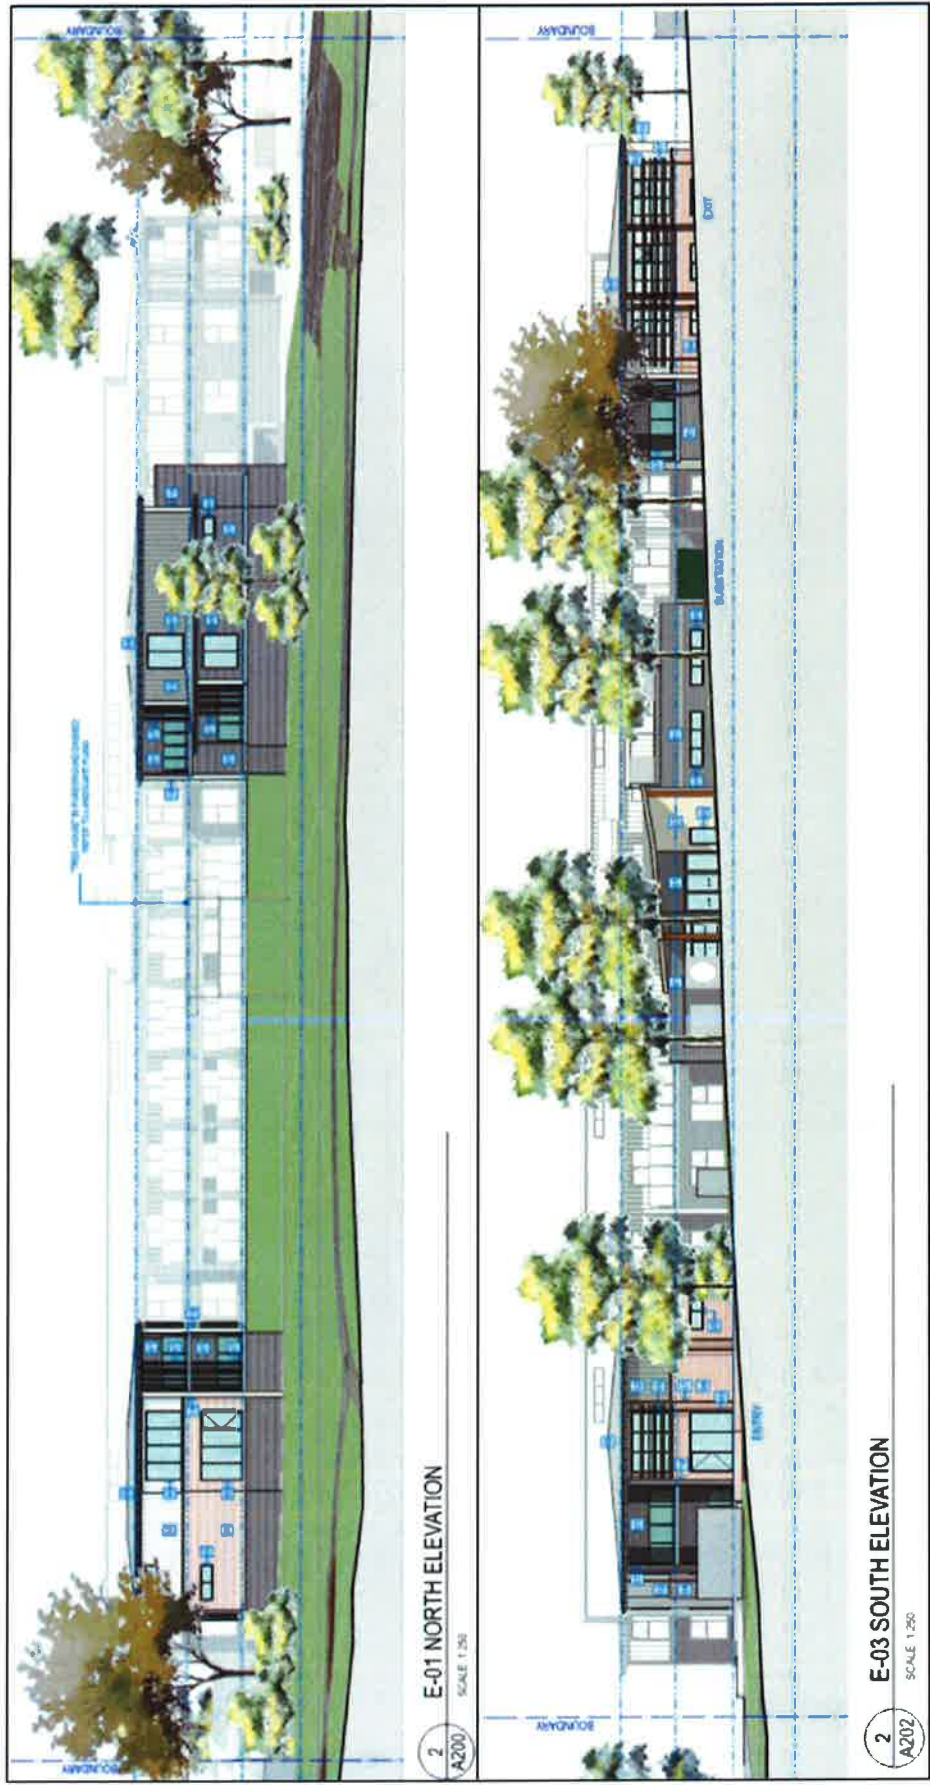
Proposed North and South Elevation Plans (Source: Calderflower Architecture, 2019)
